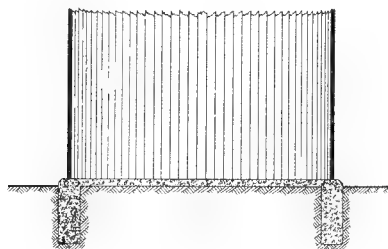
A common form of silo foundation simply a ring-shaped wall.
